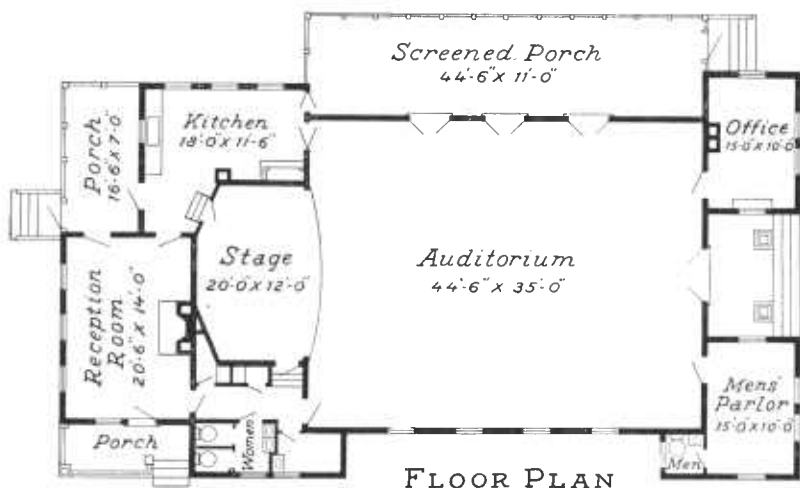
Floor plan of Madison building. (By courtesy of Burt McDonald, architect.)
